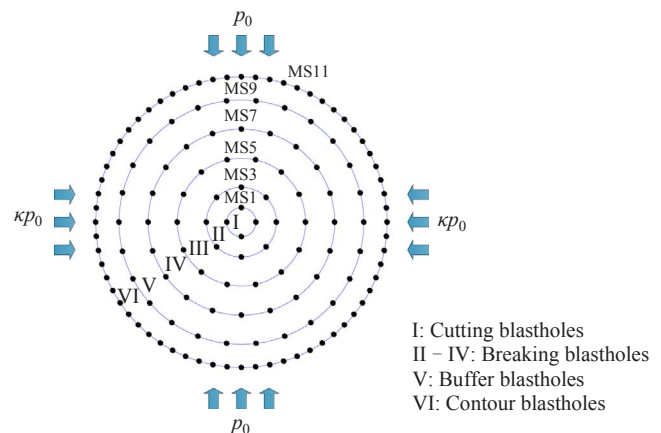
An underground tunnel excavation with the method of full-face millisecond delay blasting.
